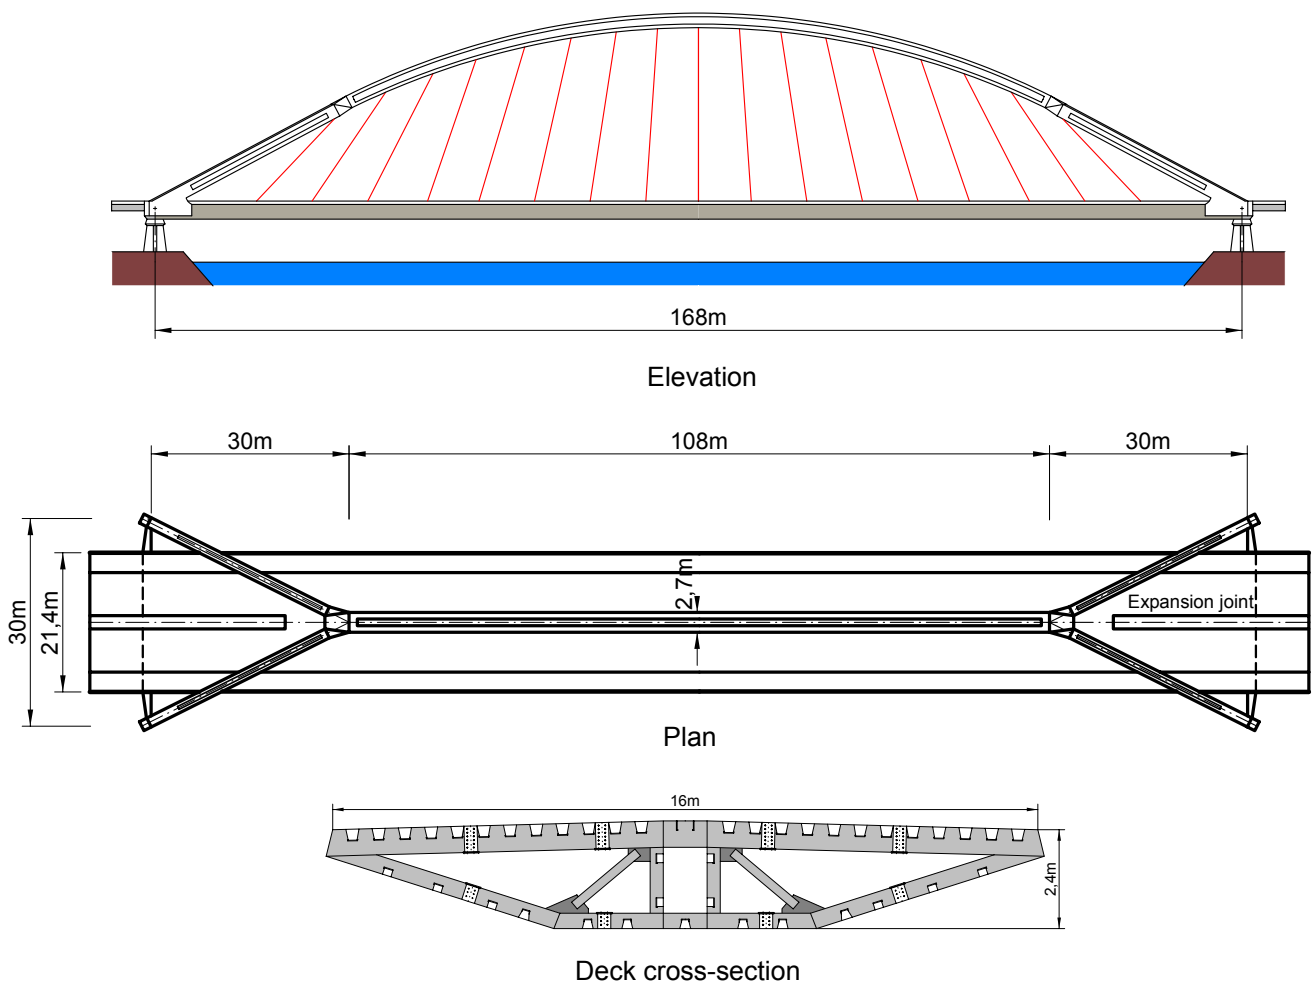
Elevation, plan and deck cross-section of the Barqueta Bridge
